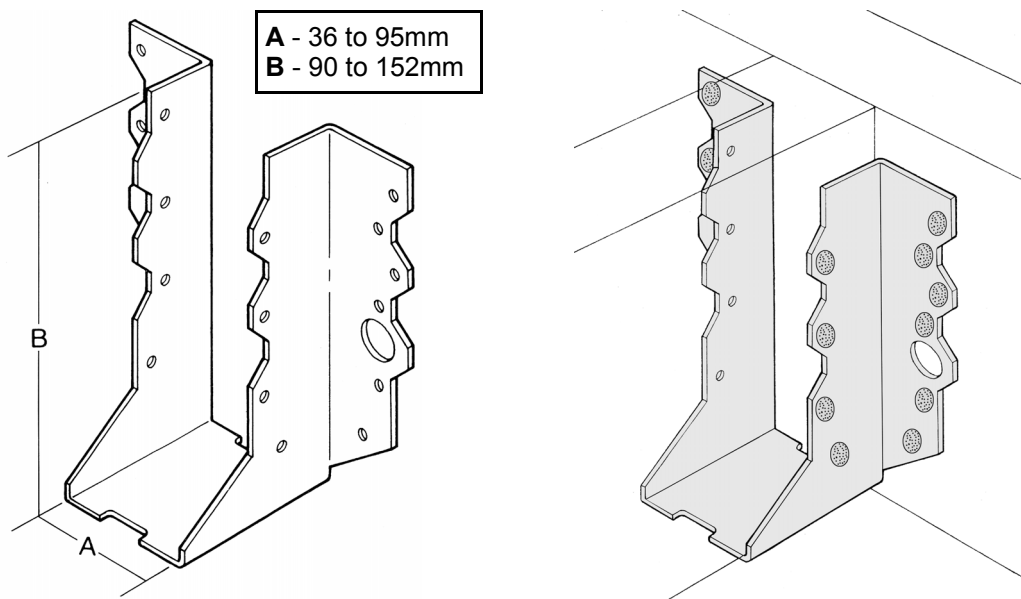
Galvanised, 1.0mm thick Joist hanger
